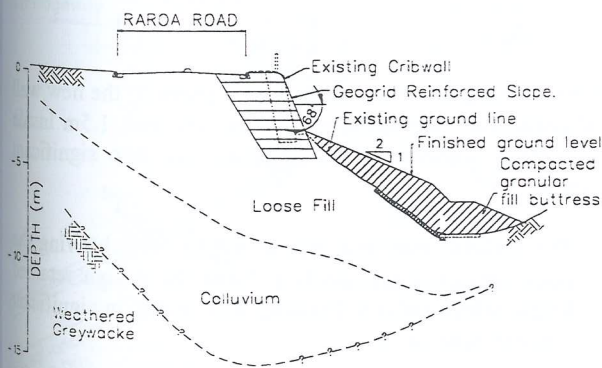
Remedial Works Area 1. Schematic Cross Section
